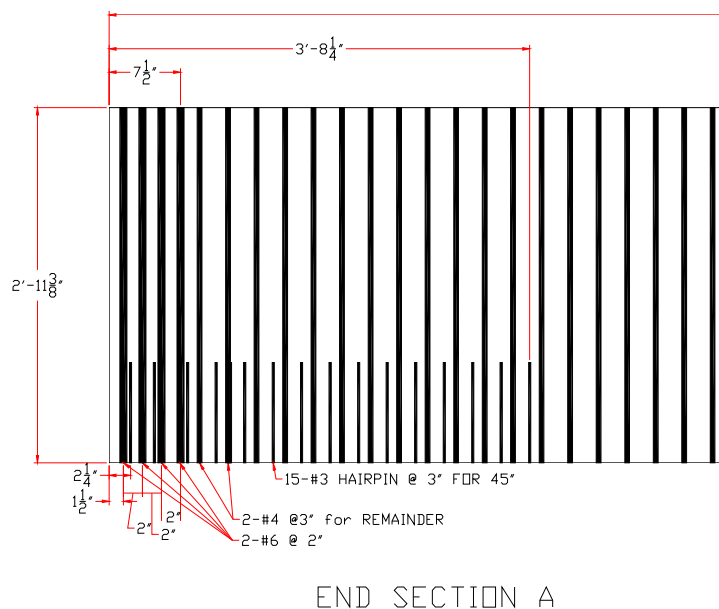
Transverse reinforcement at girder ends (Reiser, 2007)
